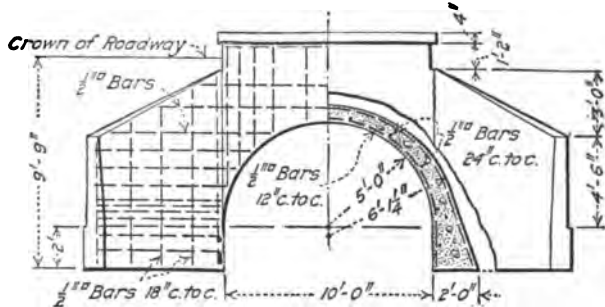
Standard design for 10-ft. arch culvert, State of Missouri Highway Department. (Actual dimensions and shape of foundations governed by conditions of soil at location of site.)
